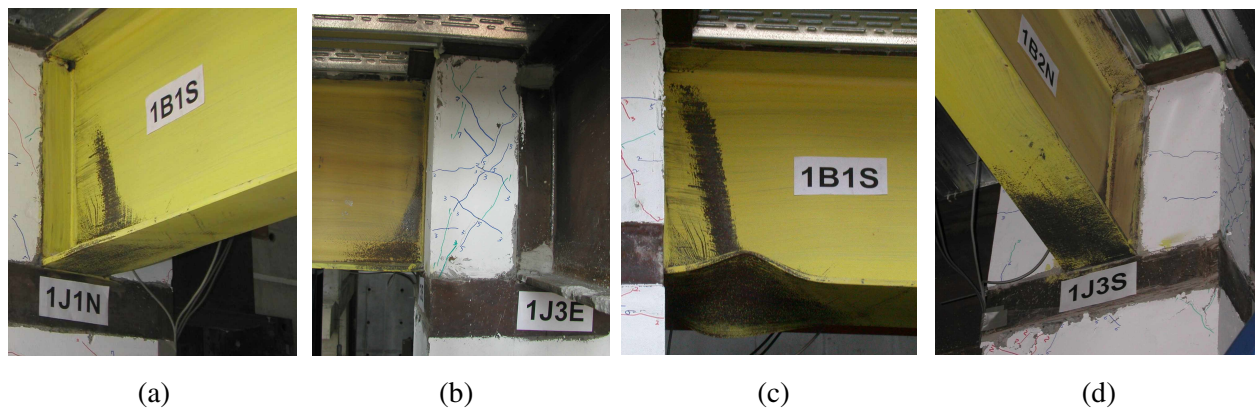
Typical conditions of exterior beam (1B1S) and interior beam/composite joint (1J3) following (a, b) the design level and (c, d) the maximum considered earthquakes.
